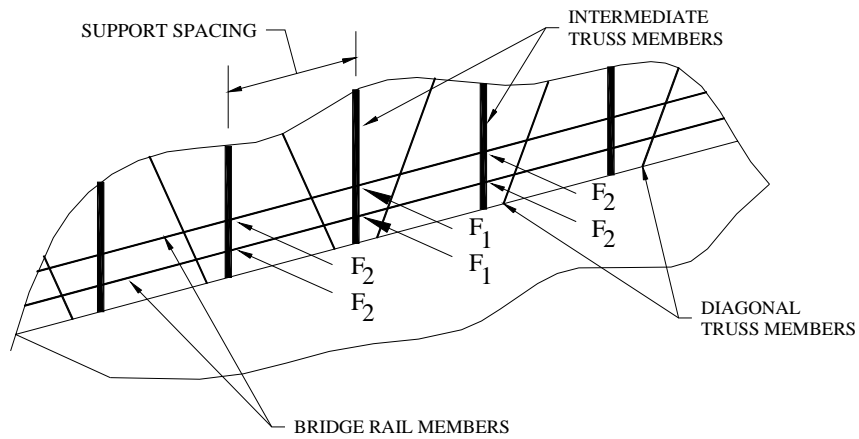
Configuration of Design Crash Loads at Intermediate Truss Members.
